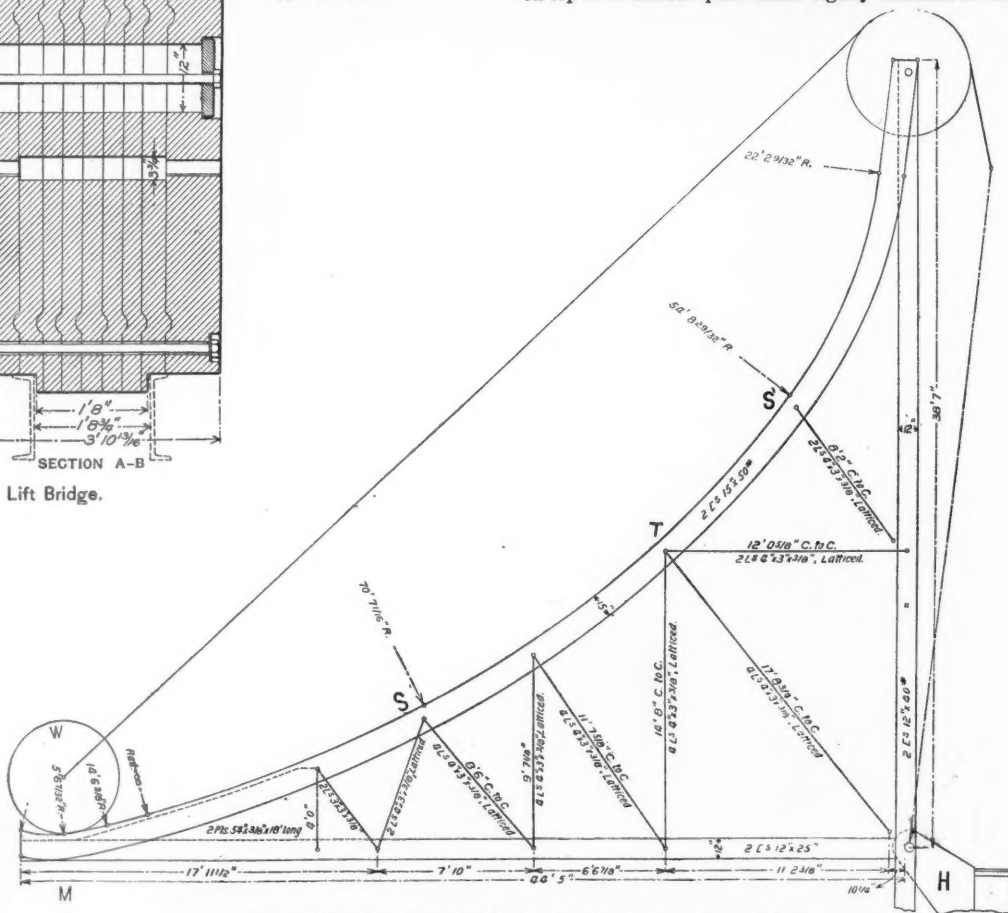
Diagram of Truss for Counterweight—Berry's Creek Bridge.
